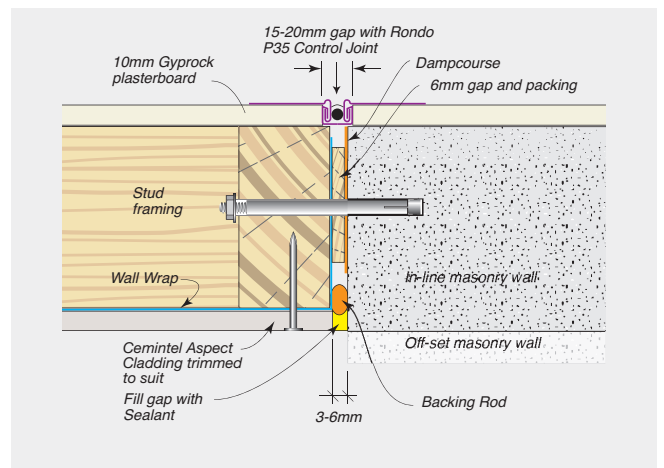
Junction of Aspect Cladding System with Offset or In-line Masonry Wall – Plan View
